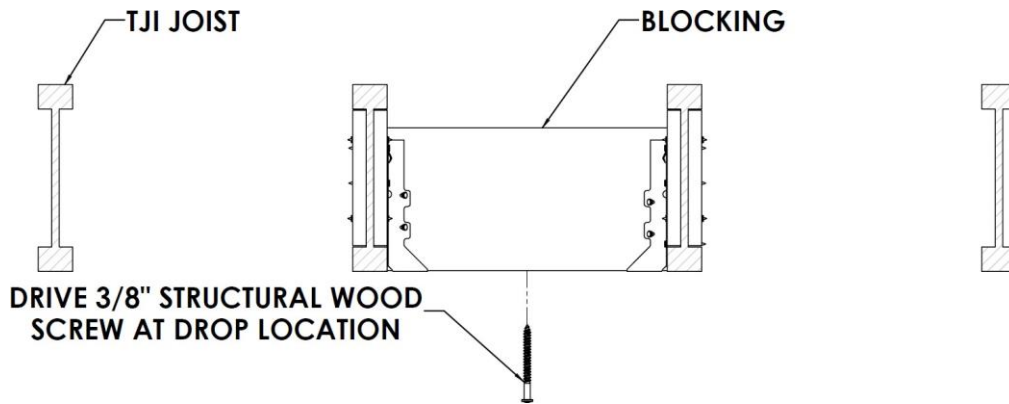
Position for Structural Wood Screw or Lag Bolt
